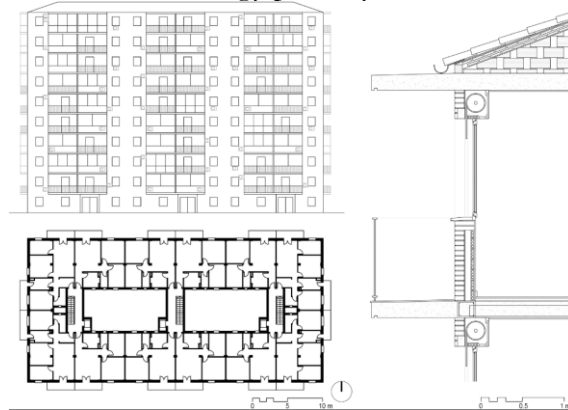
Layout of the existing building: elevation, floor plan and vertical section of the top floor - representative typology of Spanish housing. Source: Olatz Pombo, Beatriz Rivela, and Javier Neila, 'Life Cycle Thinking toward Sustainable Development Policy-Making: The Case of Energy Retrofits', *Journal of Cleaner Production* 206 (1 January 2019): 267–81. p-271.
